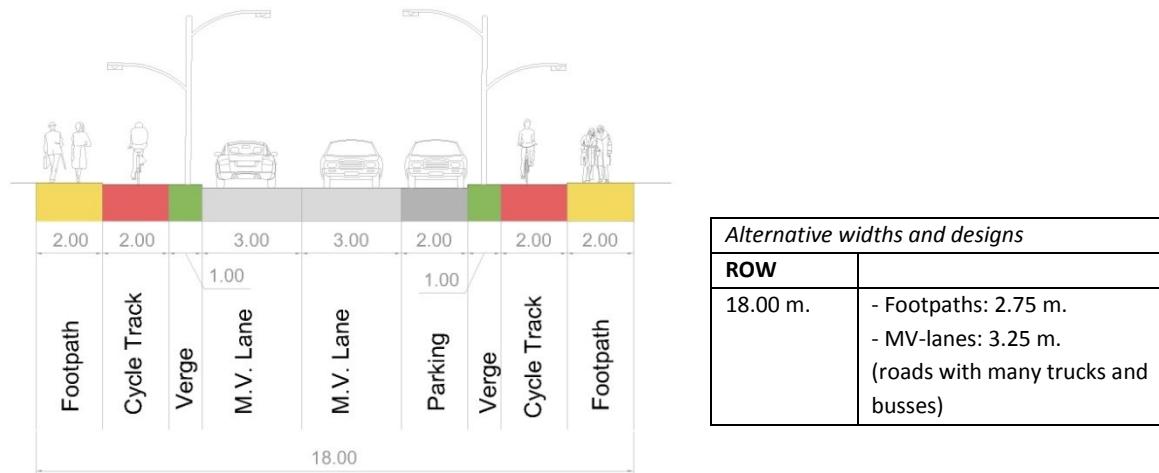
Collector road (18 m) with segregated cycle tracks and parking on one side
